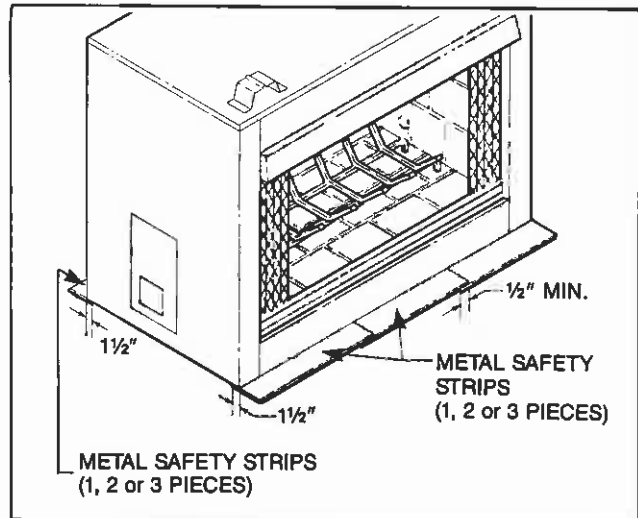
Install metal strip(s) under both fronts of fireplace.
